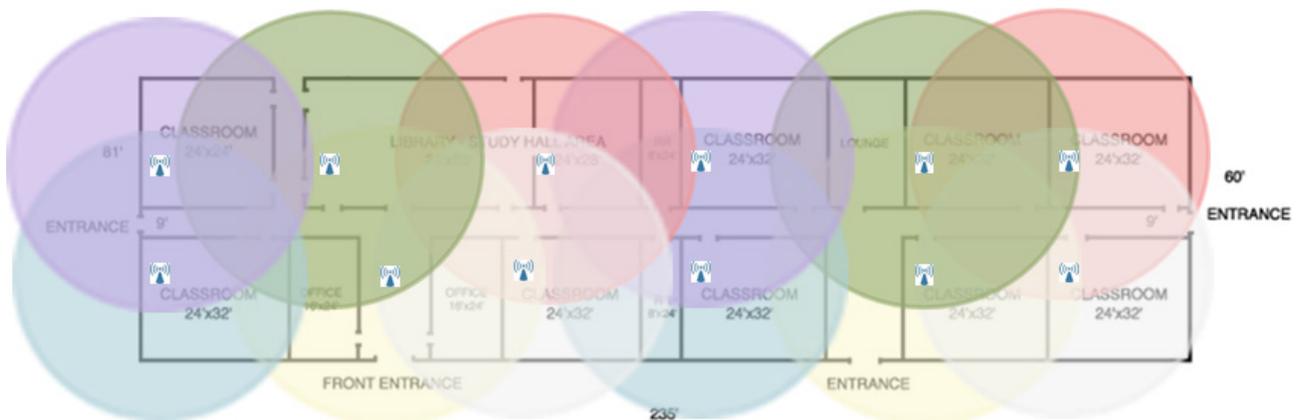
Classroom AP Placement Plan and 5 GHz Channel Plan
